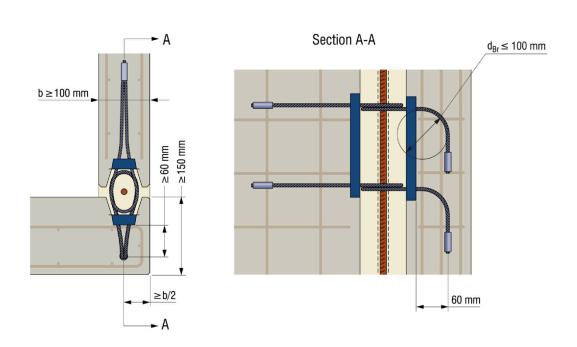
Wall – Wall – CORNER CONNECTION - detail with minimum reinforcement
